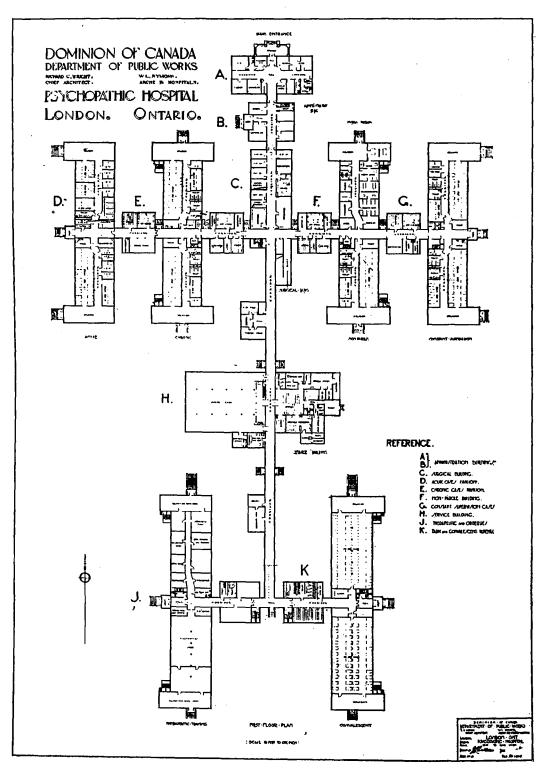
FIRST FLOOR PLAN, PSYCHOPATHIC HOSPITAL, LONDON, ONT.
